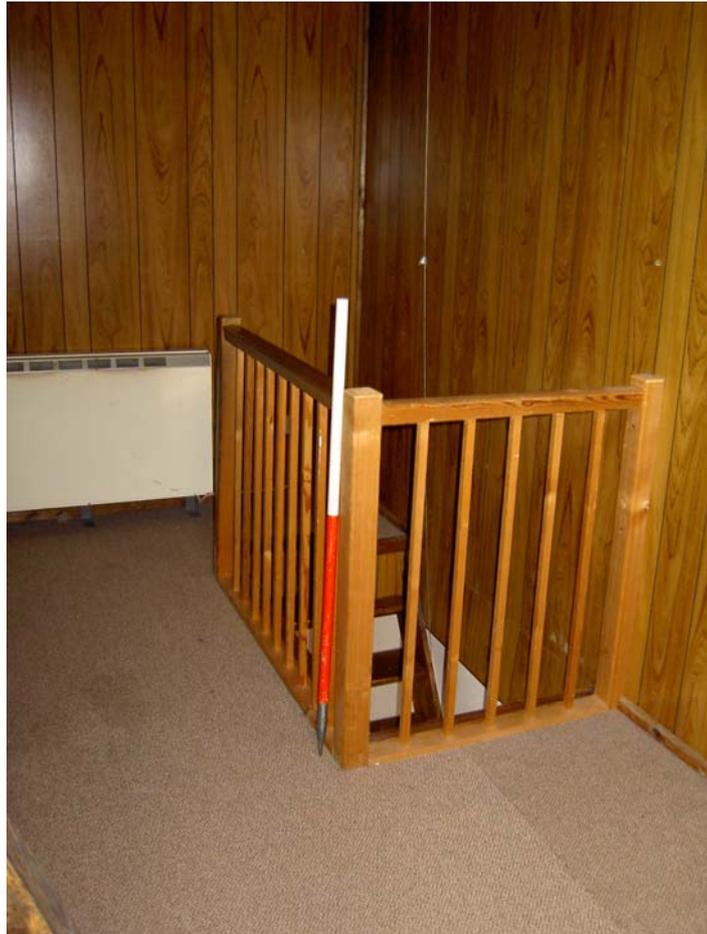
Modern handrail 171 in room S1, facing north-west (film refs. 10_53/16+17_27-28)
